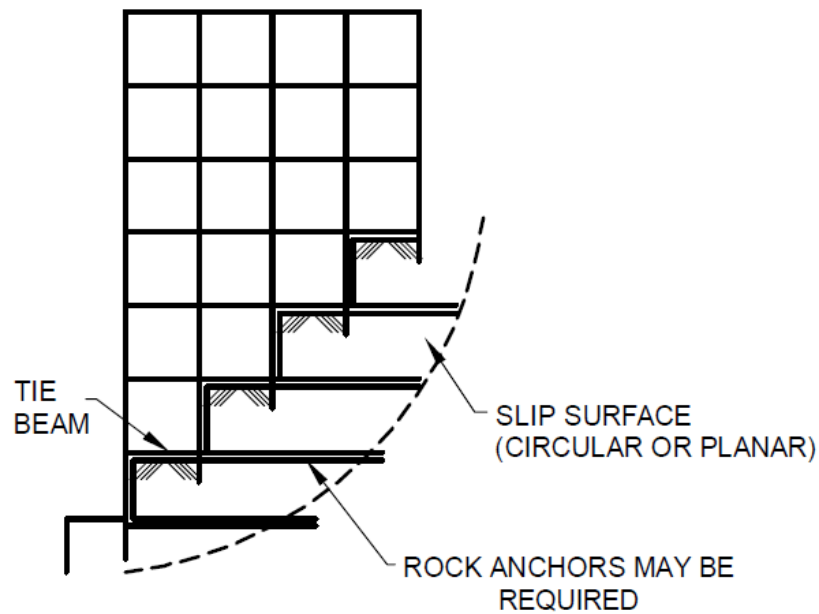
MULTISTOREY BUILDING ON ROCK SLOPE HEAVY
